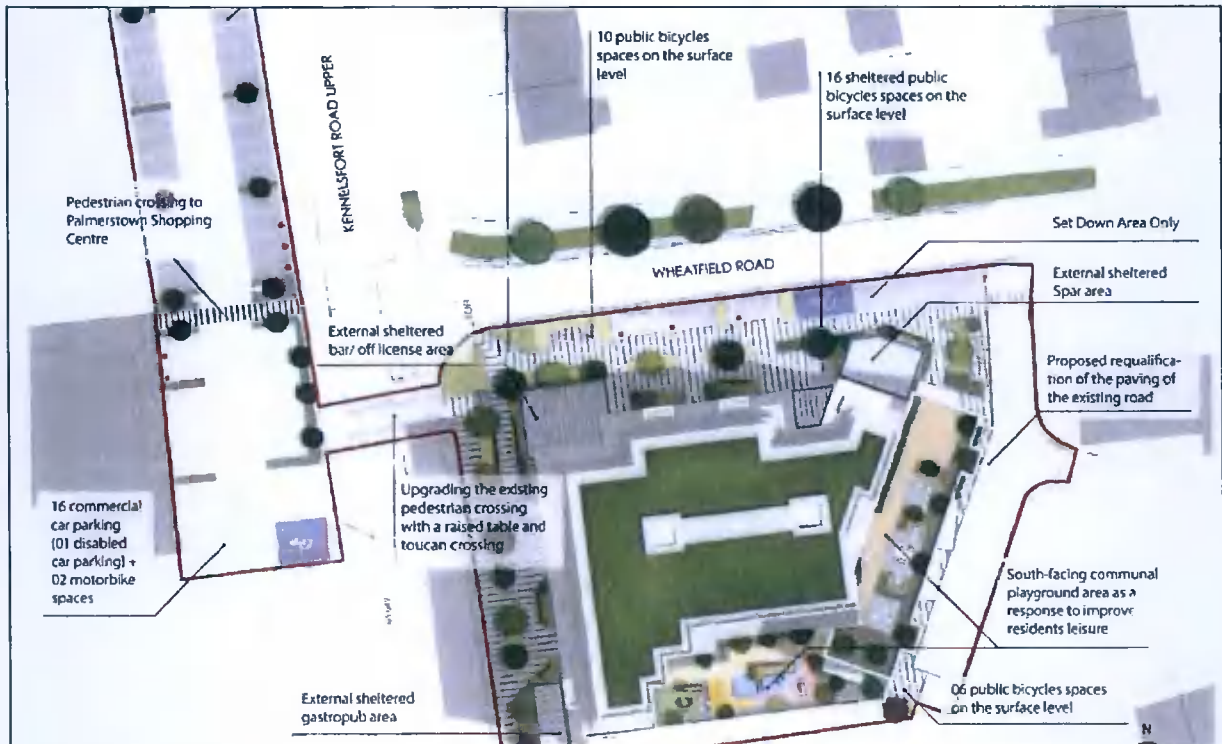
Conceptual site plan of proposed mixed-use commercial and residential development under Reg. Ref. SD21A/0271.
